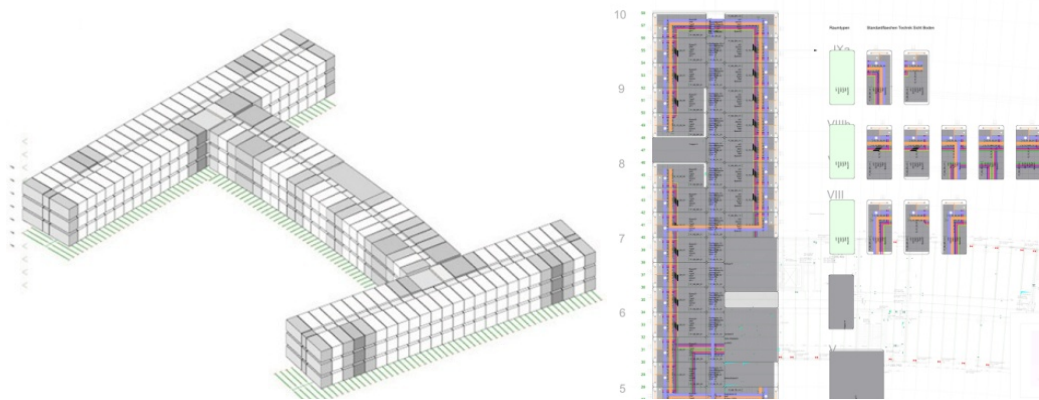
Structure of building geometry and space utilization (left hand side); structure of building components (right hand side).
